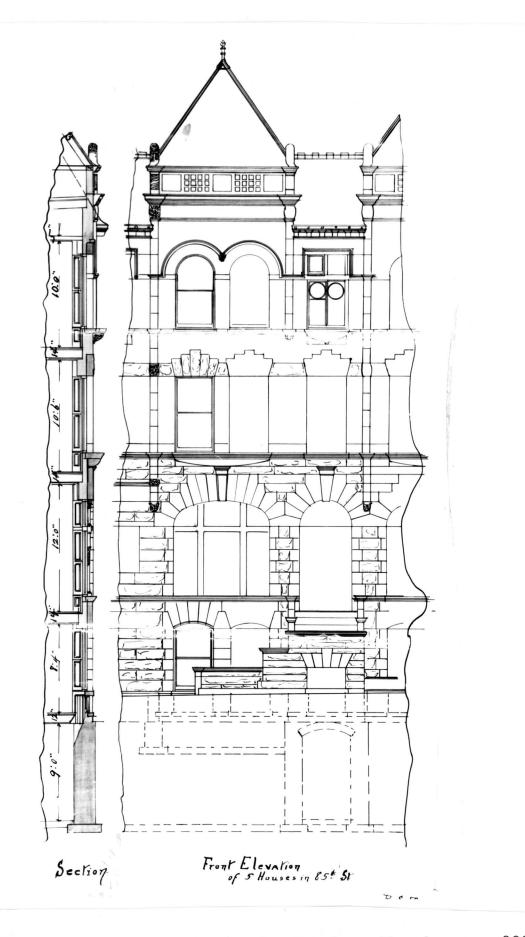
Ralph S. Townsend. Front elevation (for five houses, 329-337 West 85th Street). New York City. Buildings Department, Manhattan.
